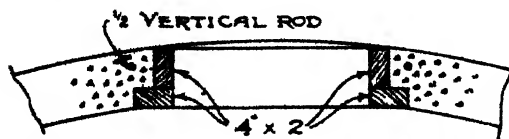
Plan of Door Openings for Circular Concrete Silo.
